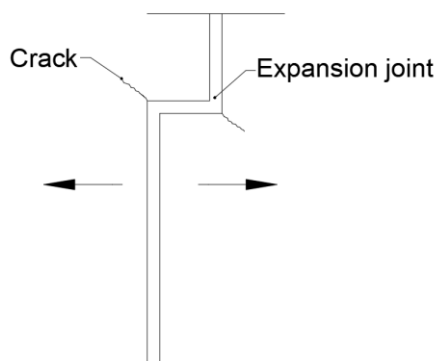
Cracking in expansion joint due to irregularity within the joint.
